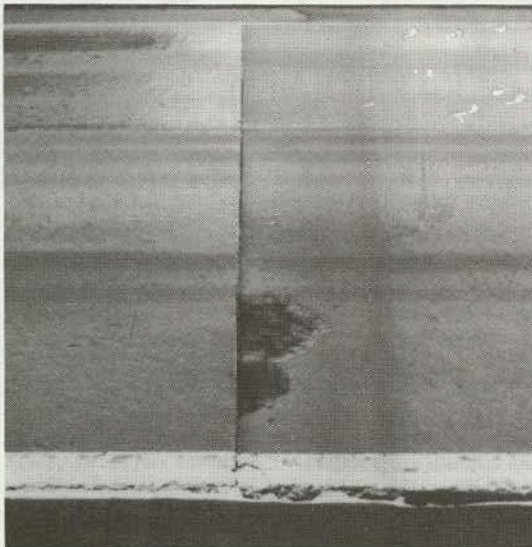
High-Severity Spalling (Transverse Joint) (safety hazard).
